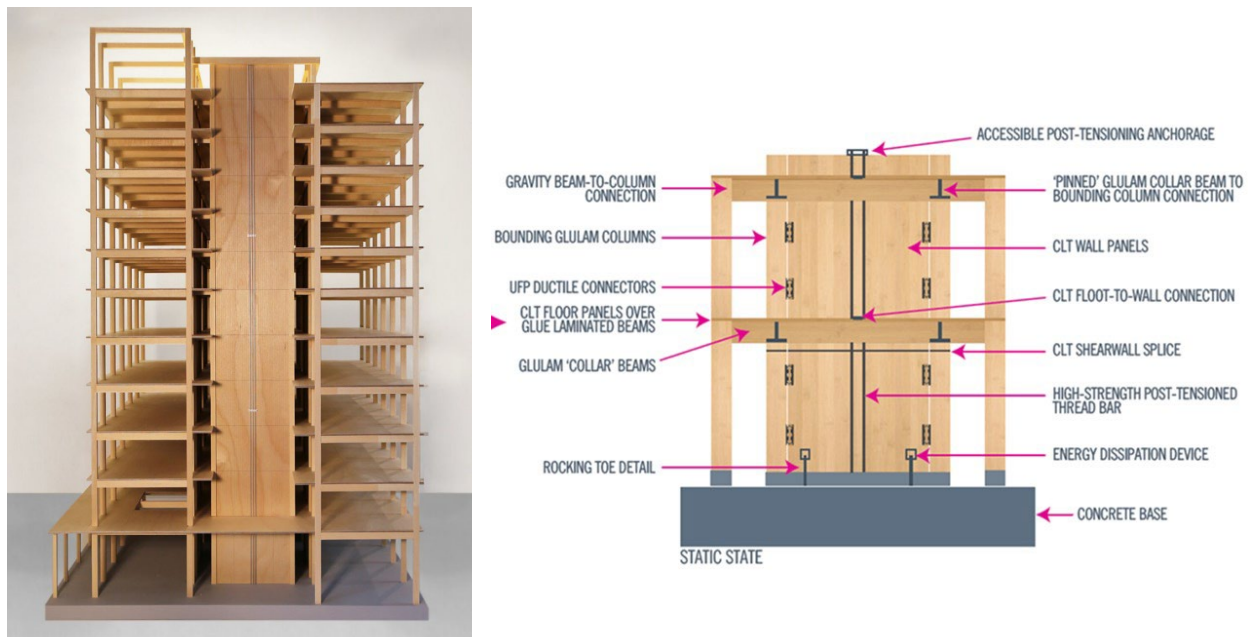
Rendering of the Framework building with a continuous Pre-Lam™ wall system (left) and detail of the Pres-Lam™ wall system (right) (courtesy of KPFF).
